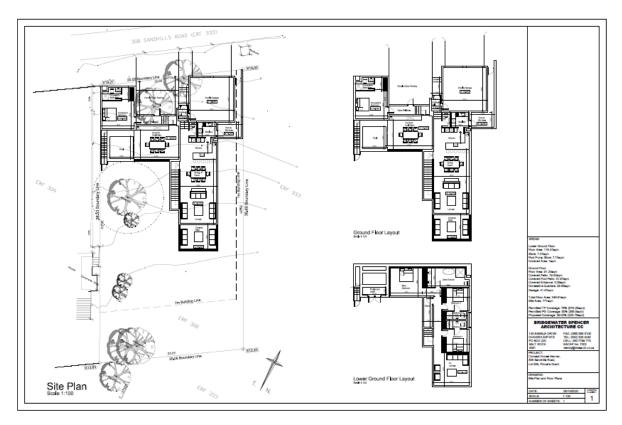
Proposed Layout for the House Havnar Residential Development (excluding bulk service infrastructure).
